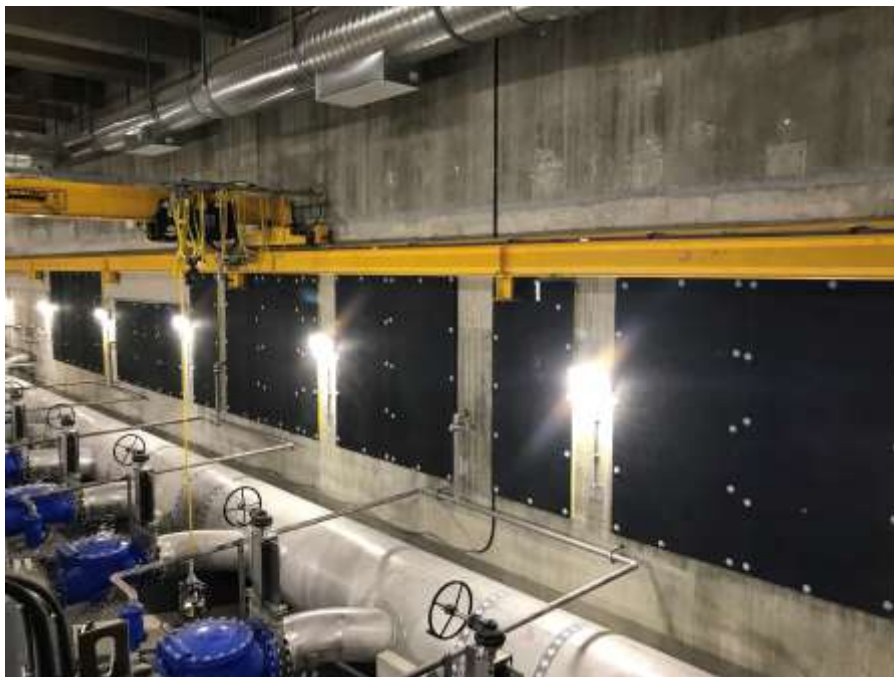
Macaulay Point Pump Station- Installation of acoustic panels in Drywell.
